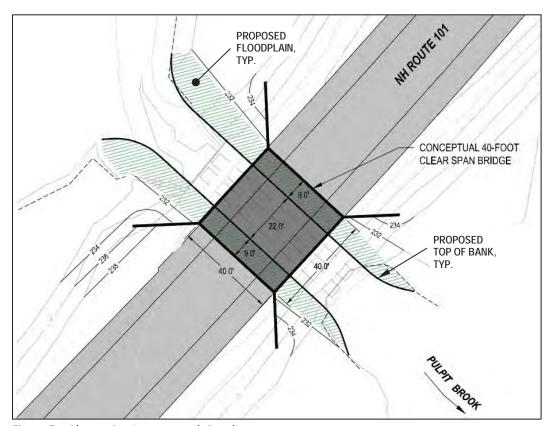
shows a portion of the conceptual site plan for Alternative 1.
